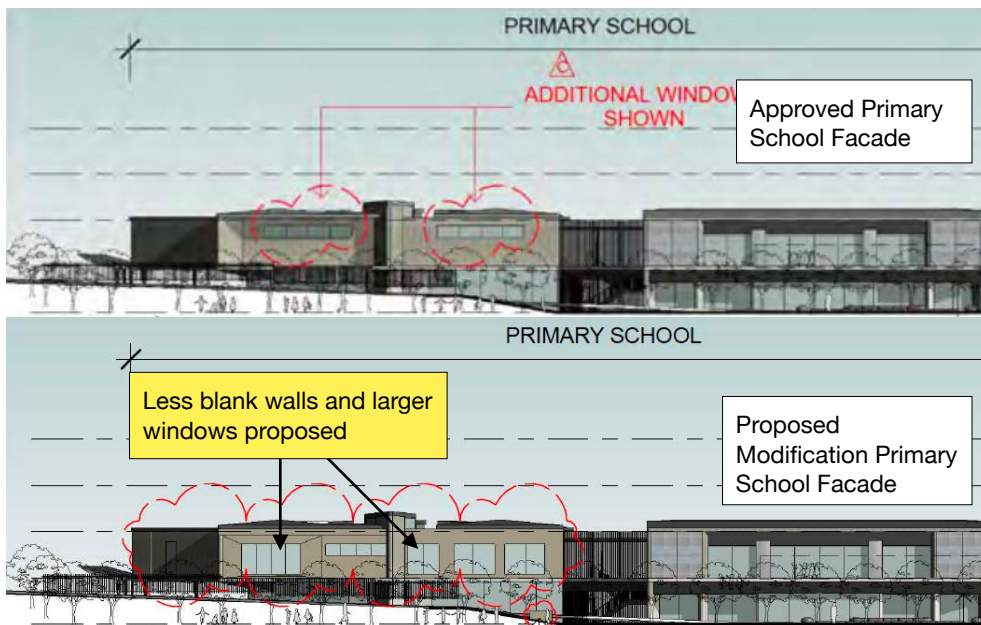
(left): Revised facade Byron Road frontage of Primary School. Larger windows and less blank walls provided- a visual improvement.
